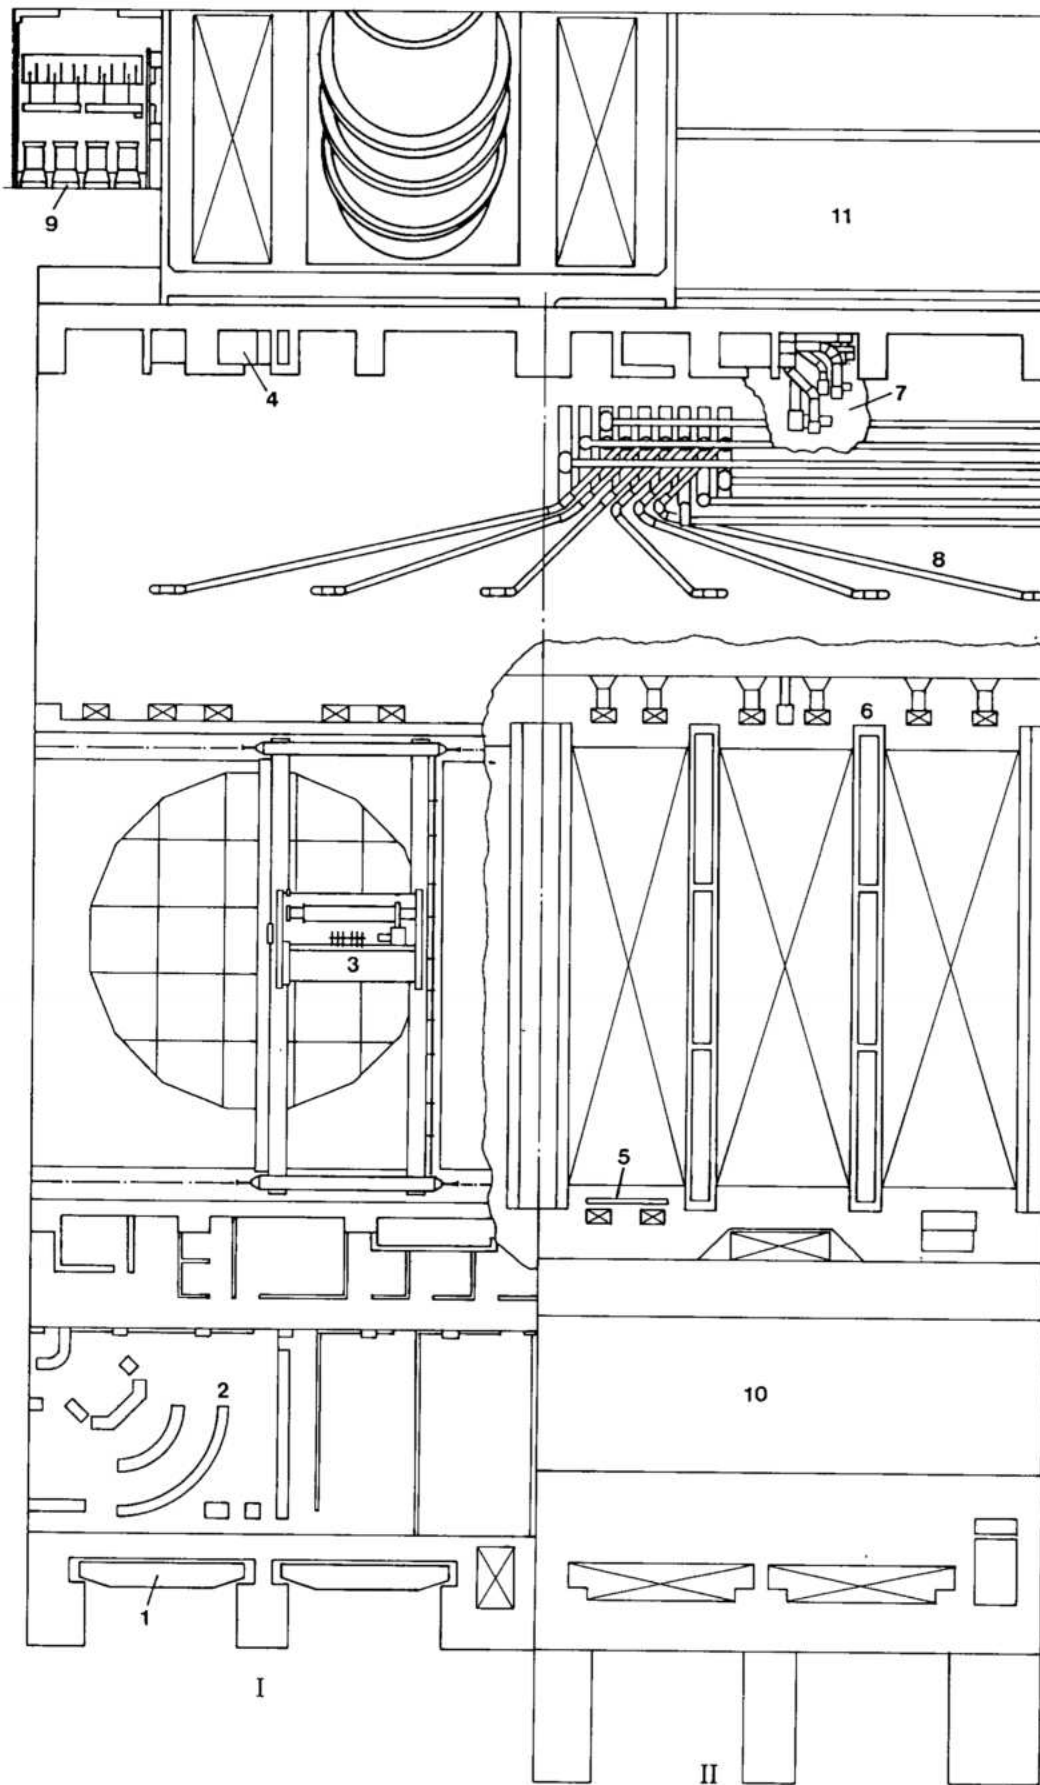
Powerhouse equipment arrangement floors at El. 135.6 and El. 144.55
